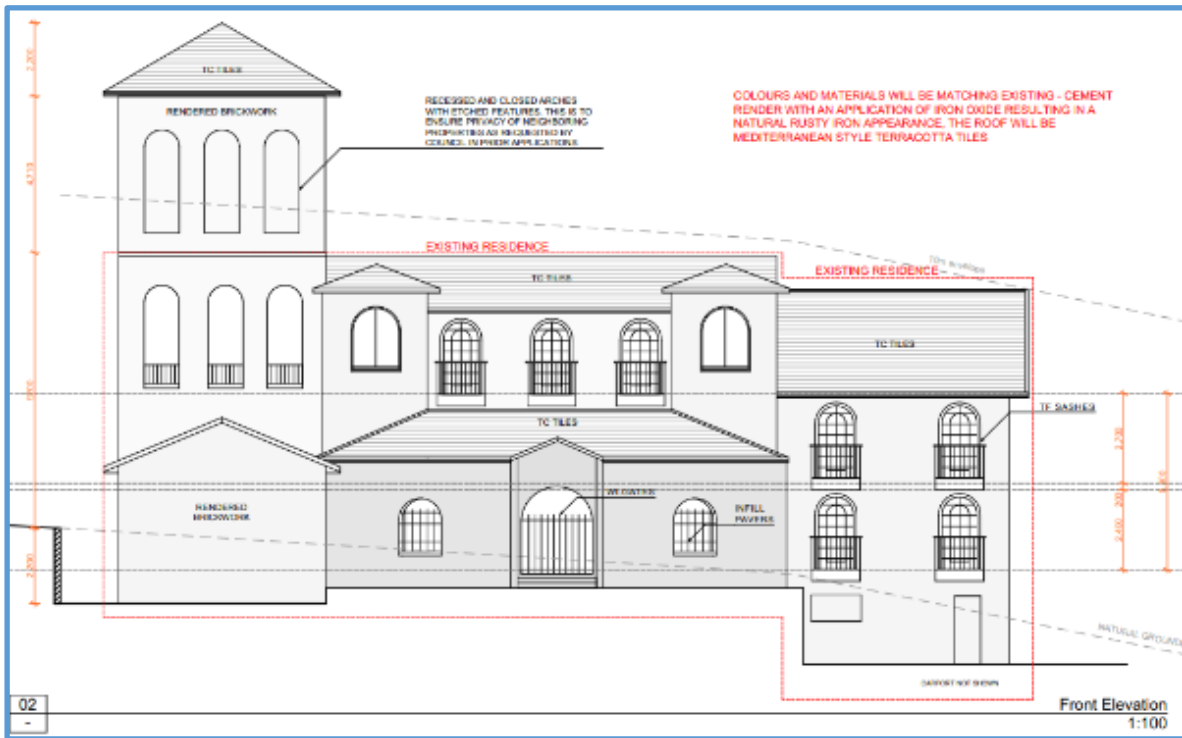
Front elevation of proposed extension to existing dwelling illustrating encroachment of 10m height plane envelope.
